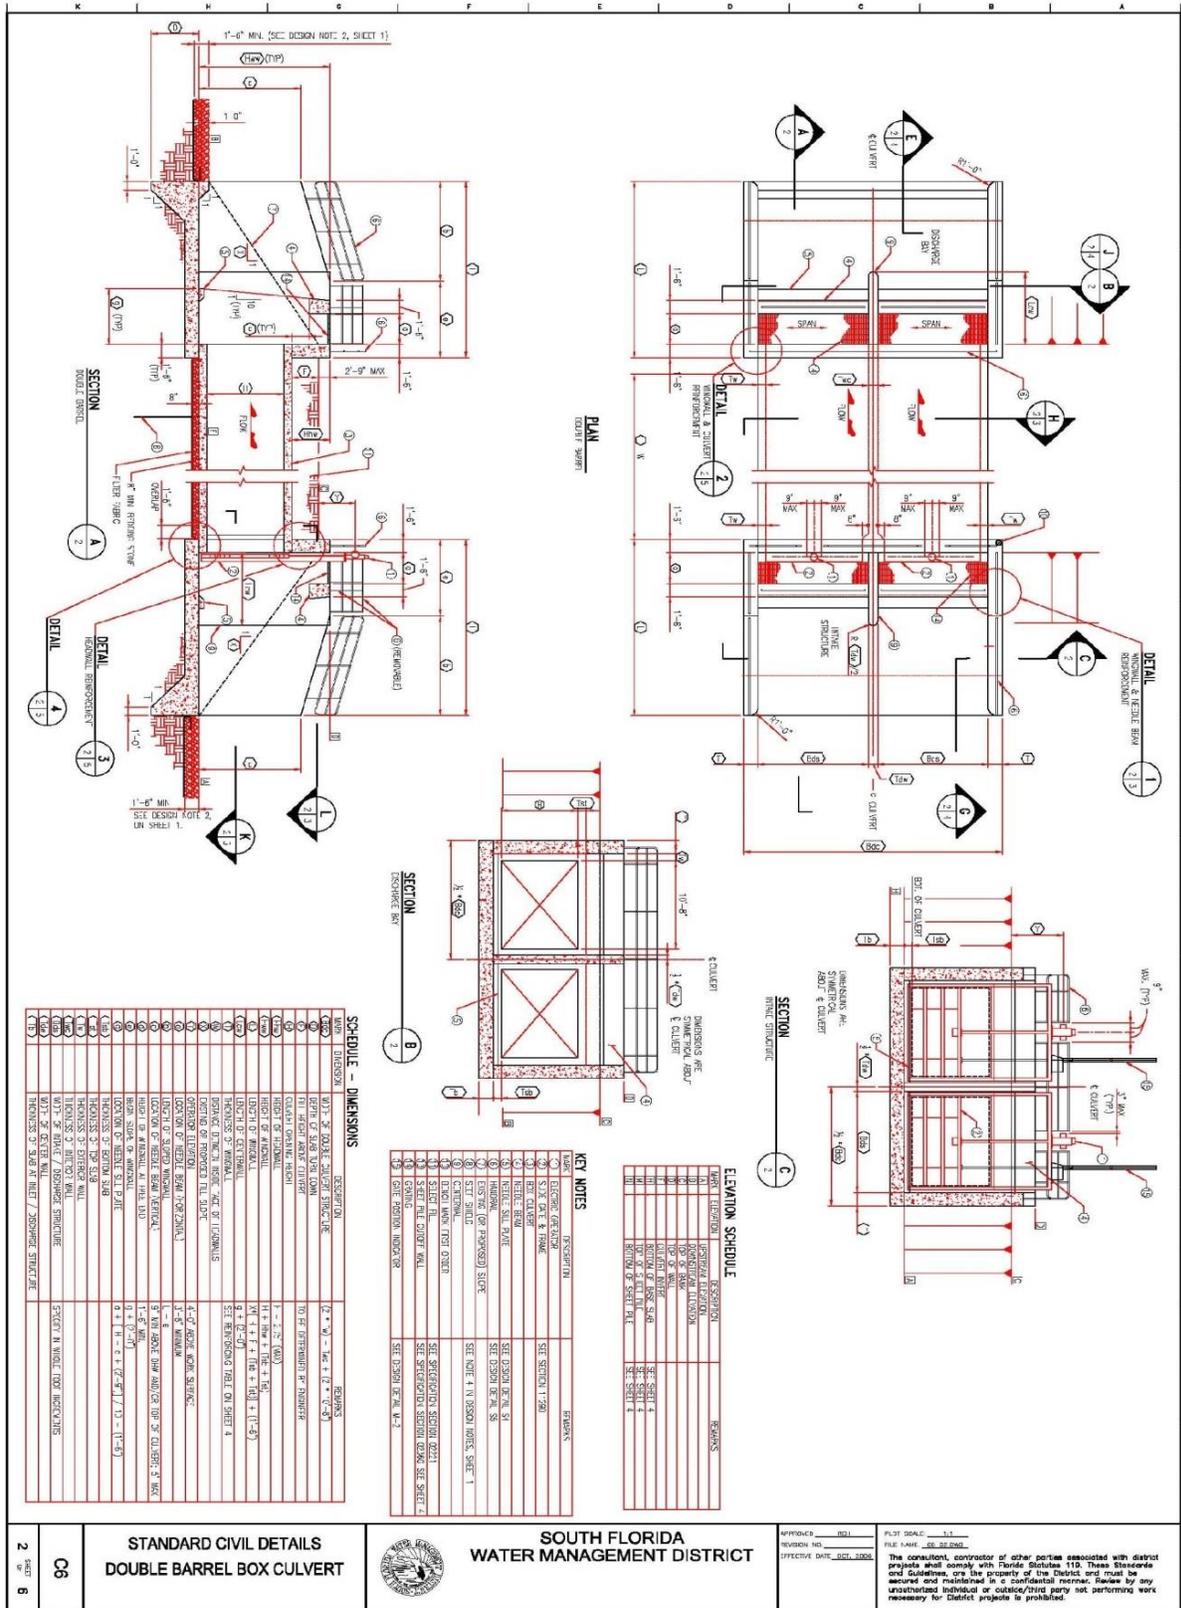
Standard Civil Details for a Double-Barrel Box Culvert
